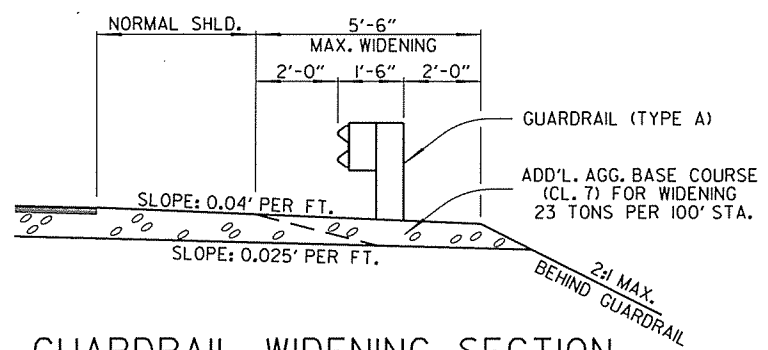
DETAILS OF ROADWAY WIDENING FOR GUARDRAIL
